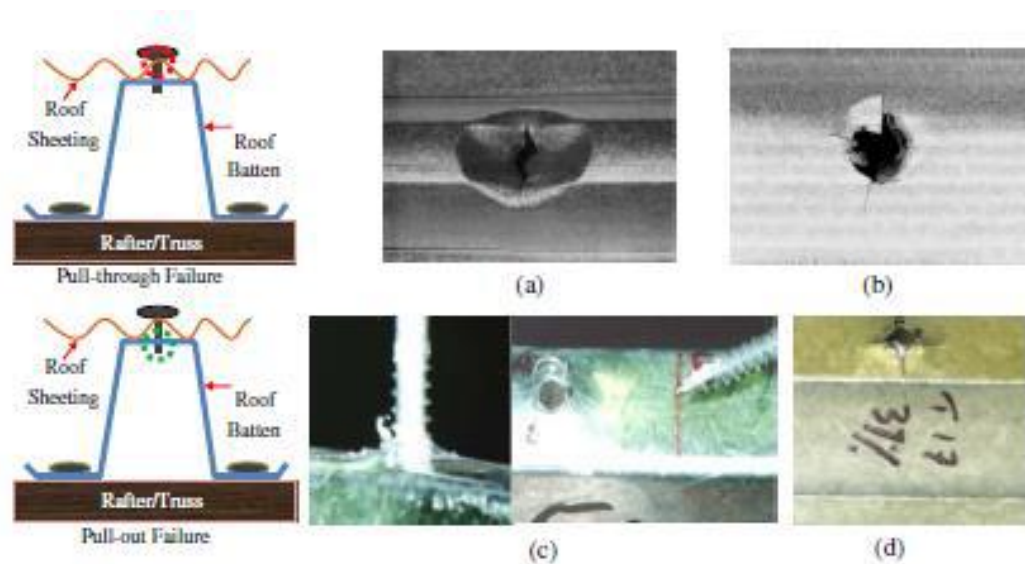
Roof purlin connection failures; (a) and (b) pull-through failure; (c) and (d) pull-out failure (Sivapathasundaram and Mahendran, 2016)
